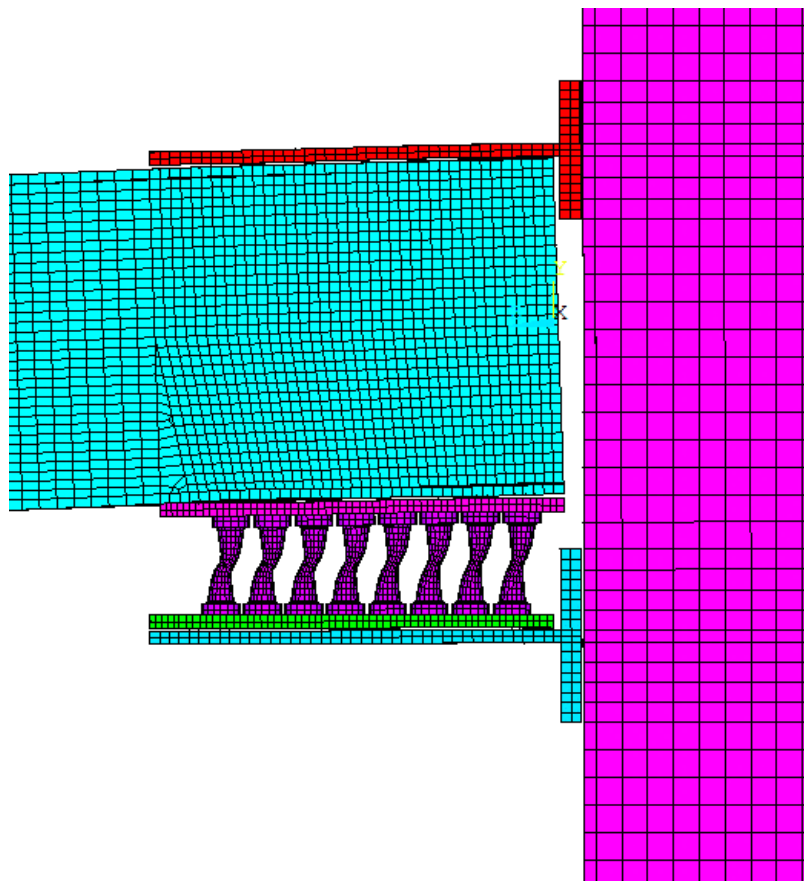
Beam-column connection with butterfly-shaped steel strut damper
